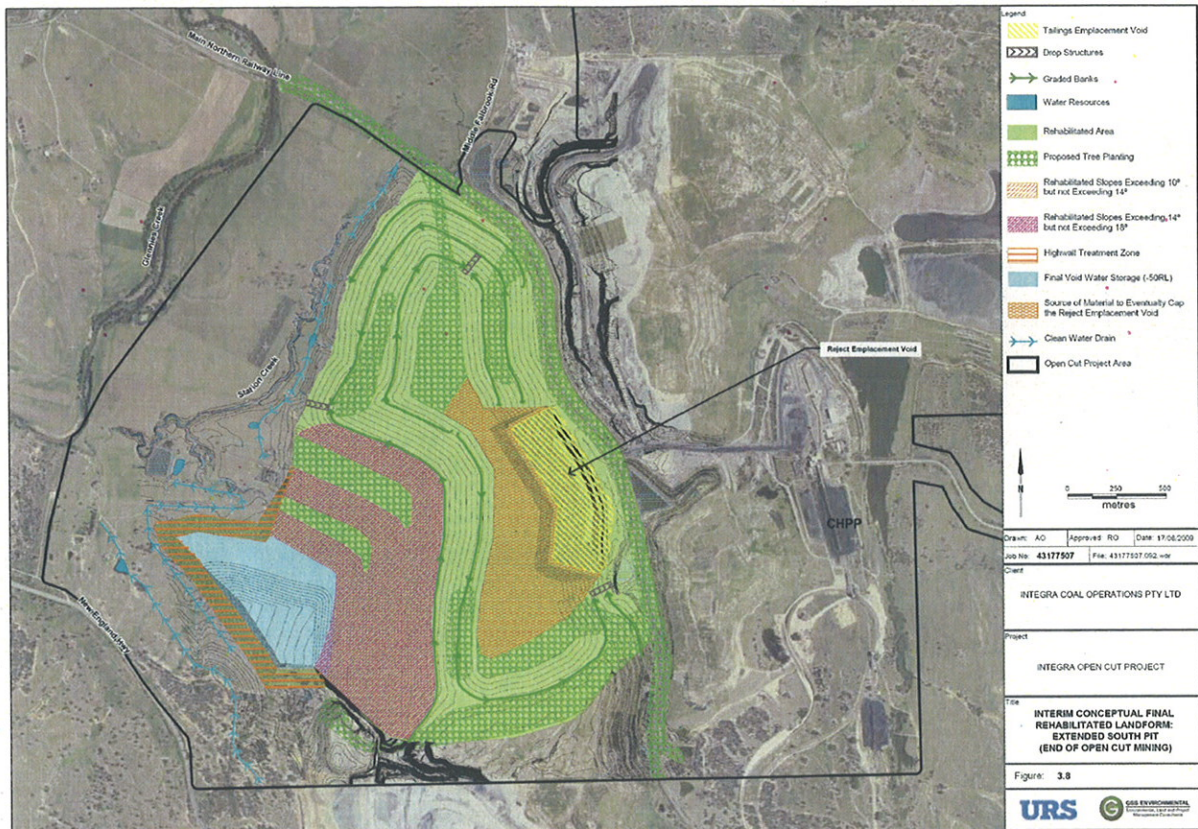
Final Rehabilitation Plan – South Pit Extension Area
